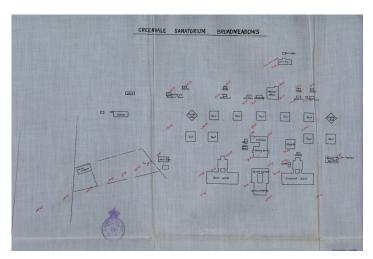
An undated site plan of Greenvale Sanatorium, c. 1912–1929, showing how the patient facilities, including accommodation, kitchen and dining room, were clustered together. The stables were set apart from this central area. PROV, VPRS 16582/P1, GV 12/284, Greenvale – Sanitorium – 1912 to 1929, available at <a href="https://provvic.gov.au/archive/B9E49293-F869-11E9-AE98-47CDDAEDBDB8?image=1#">https://provvic.gov.au/archive/B9E49293-F869-11E9-AE98-47CDDAEDBDB8?image=1#</a>.
